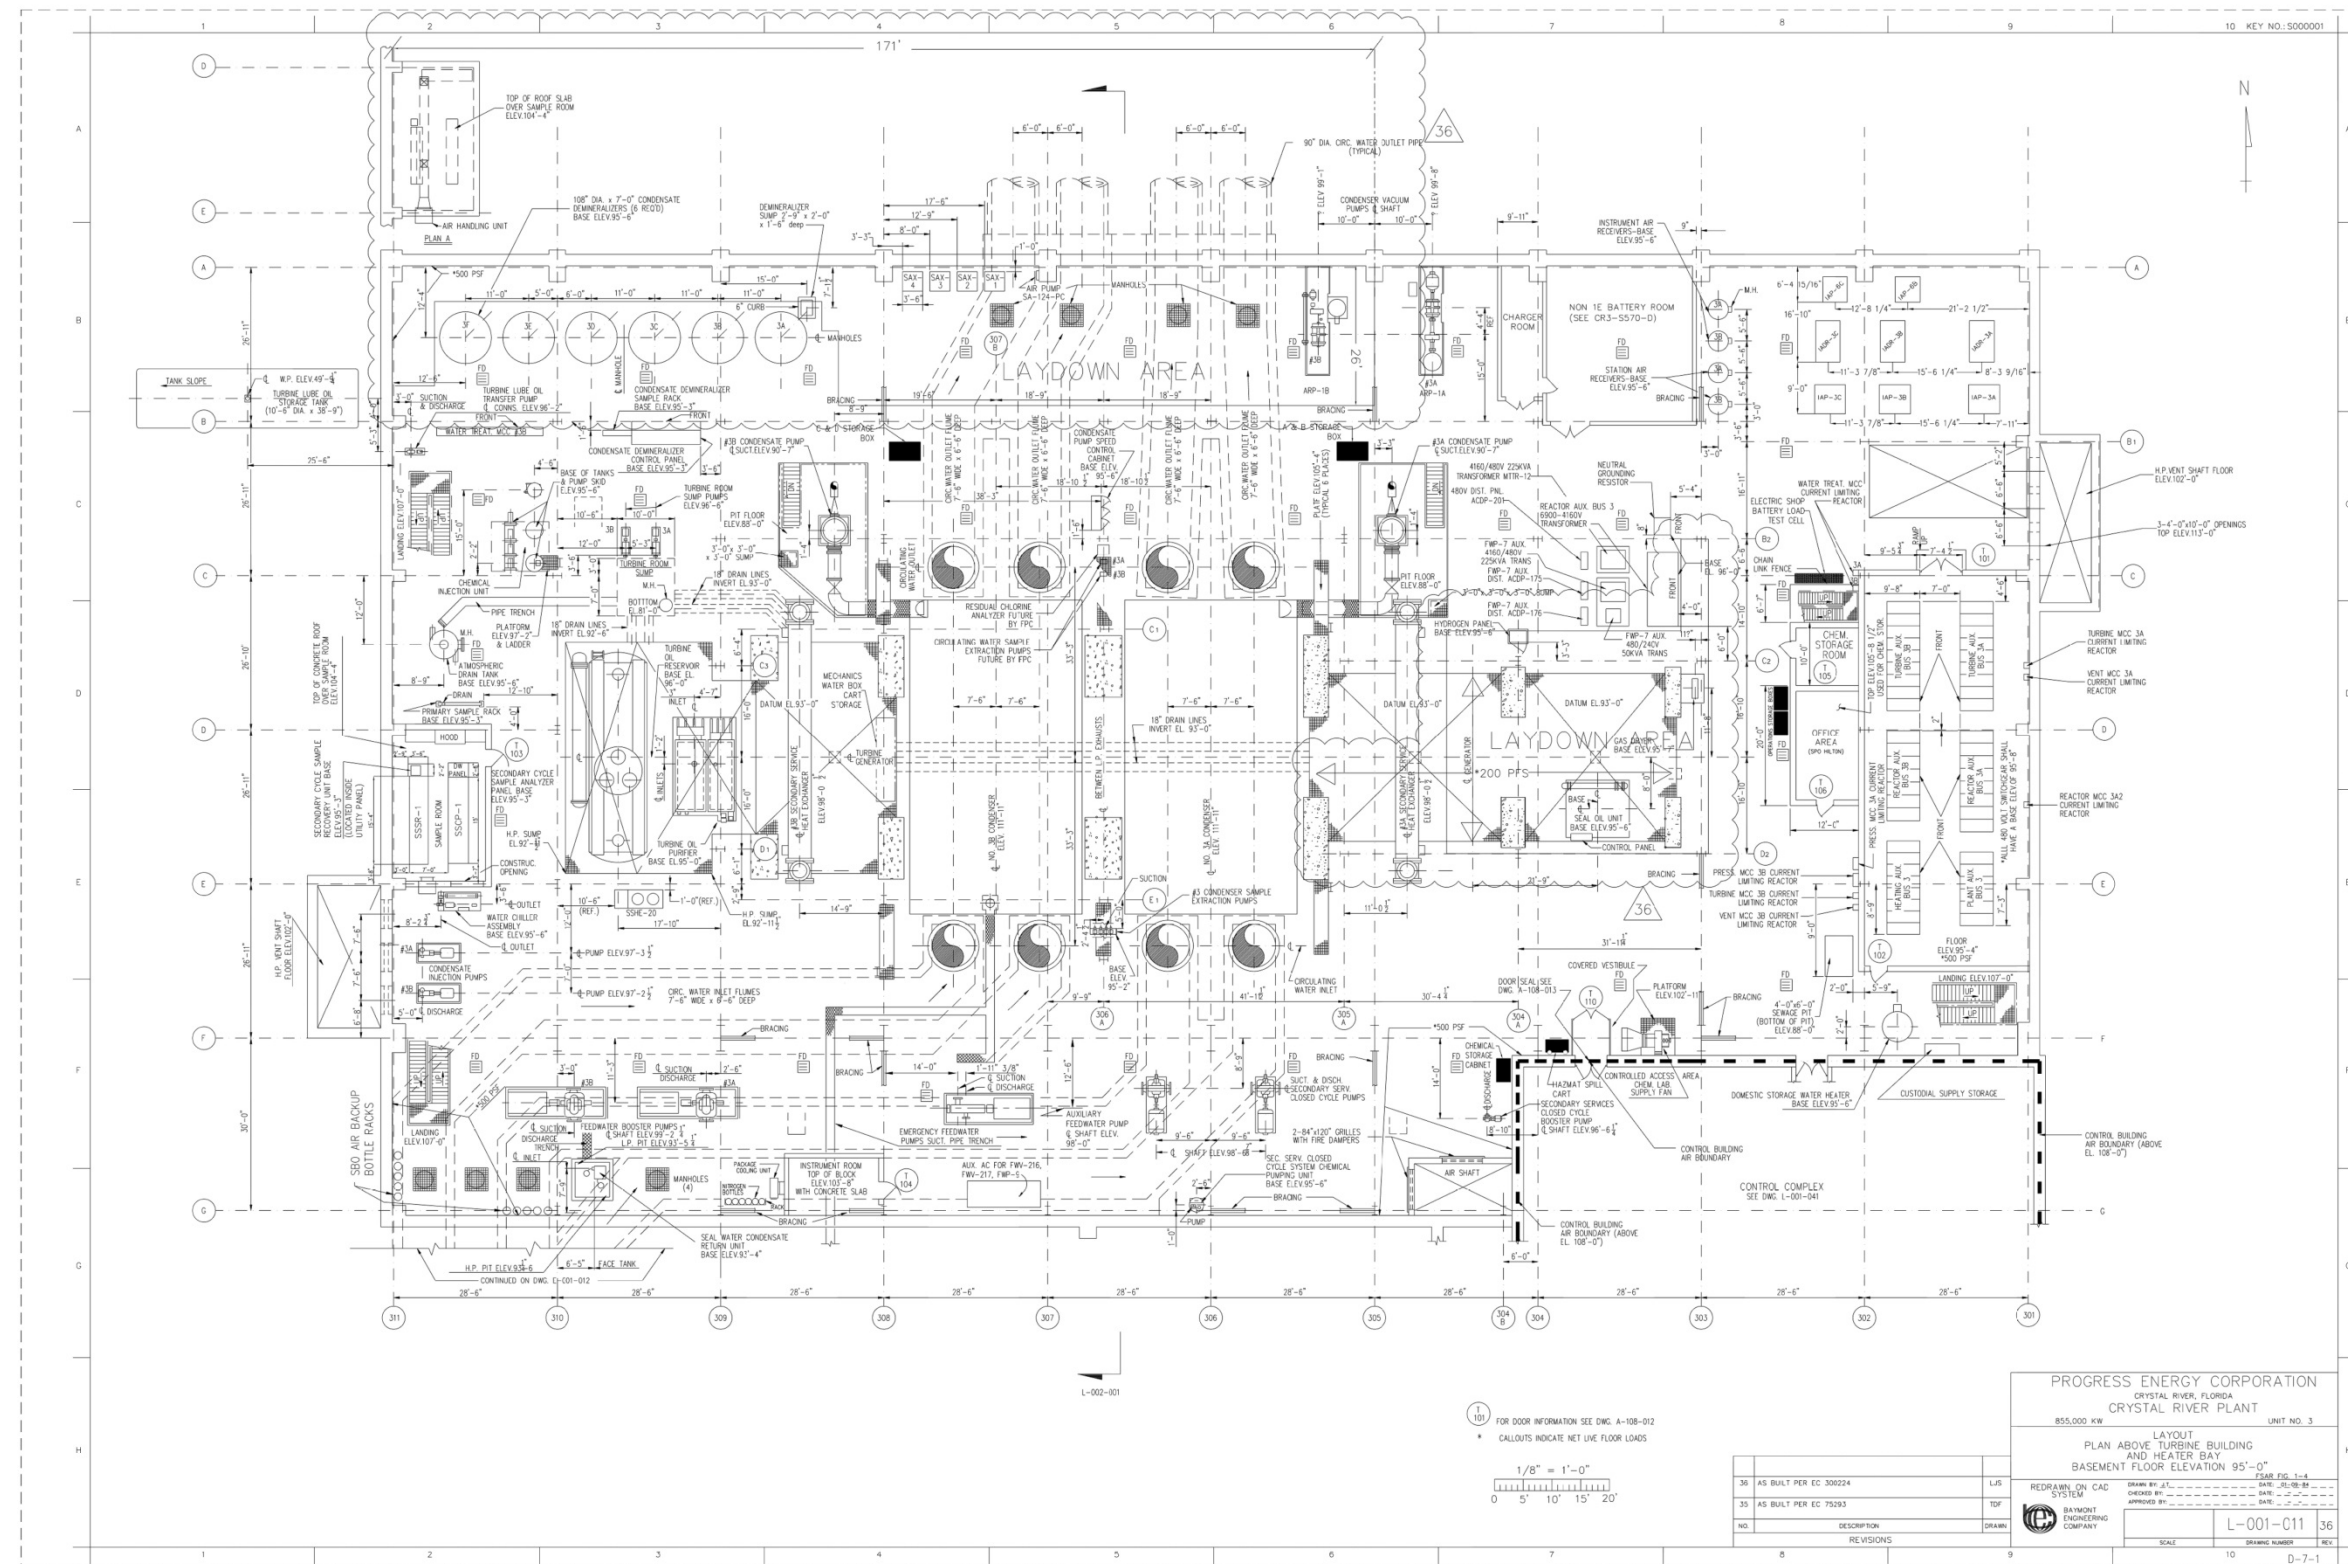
, LAYOUT PLAN ABOVE TURBINE BLDG & HEATER BAY, BASEMENT FLOOR ELEVATION 95'-0", L-001-011
